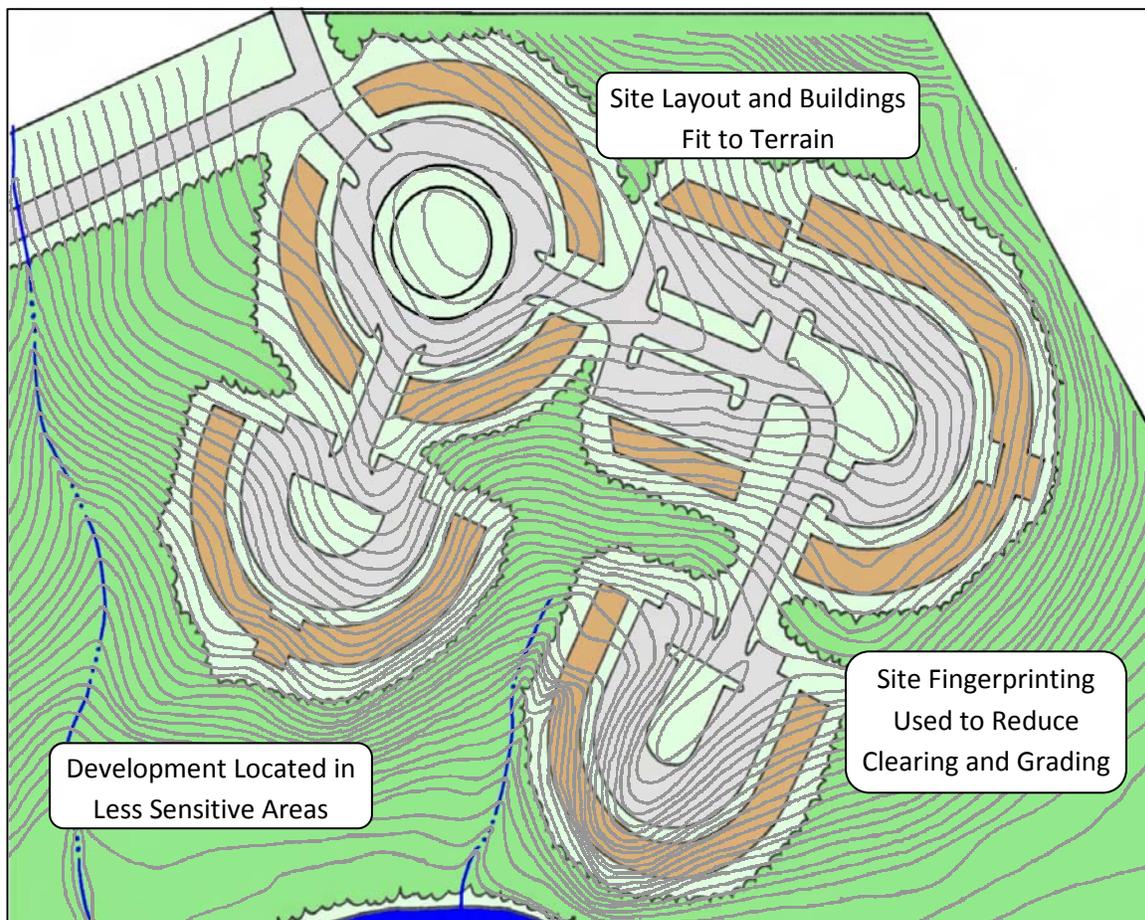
Development Design Utilizing Several Lower Impact Site Design Techniques
